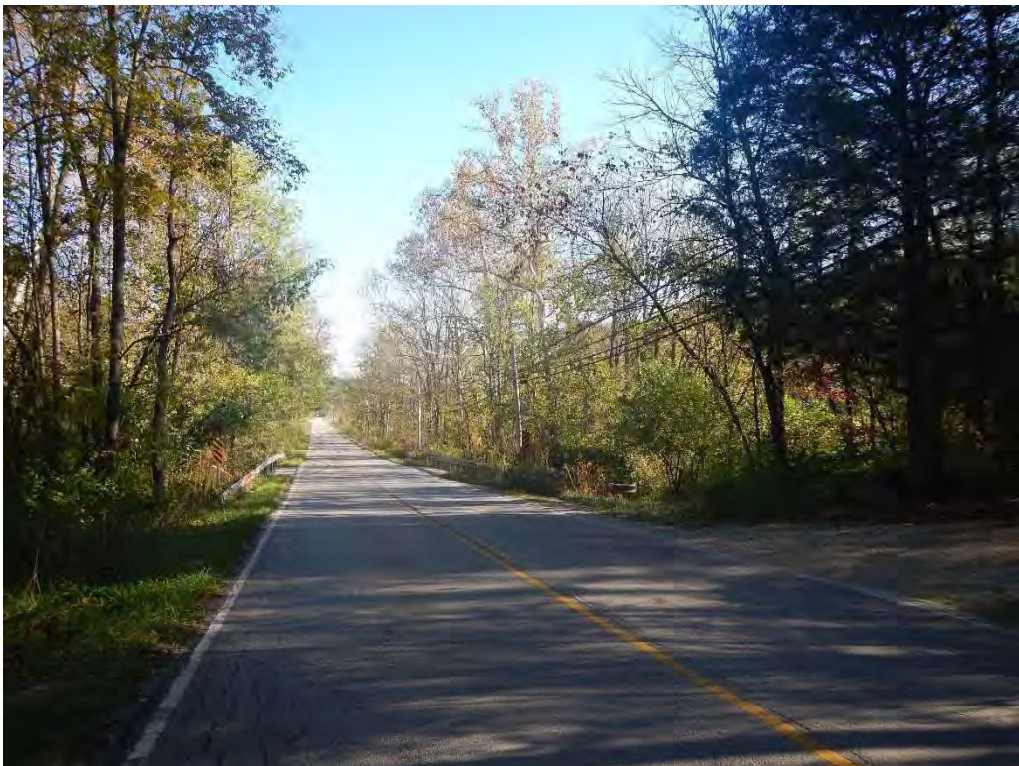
Facing northeast along Old SR 37 toward crossing of a segment of Muddy Fork.
